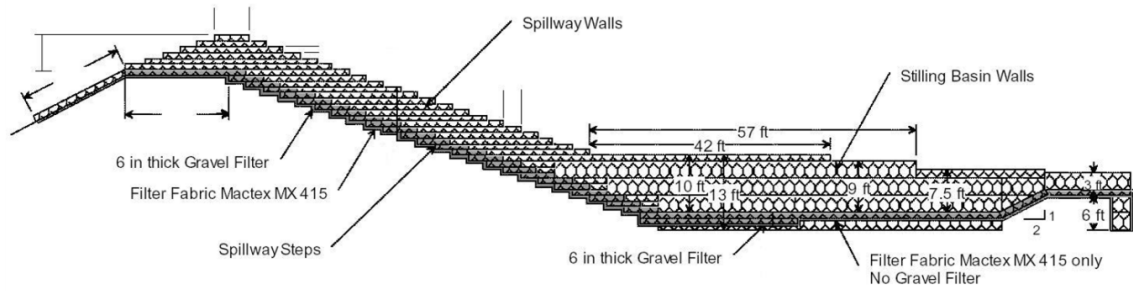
Cross section of West Cornfield Dam Protection (FEMA, 2014)
